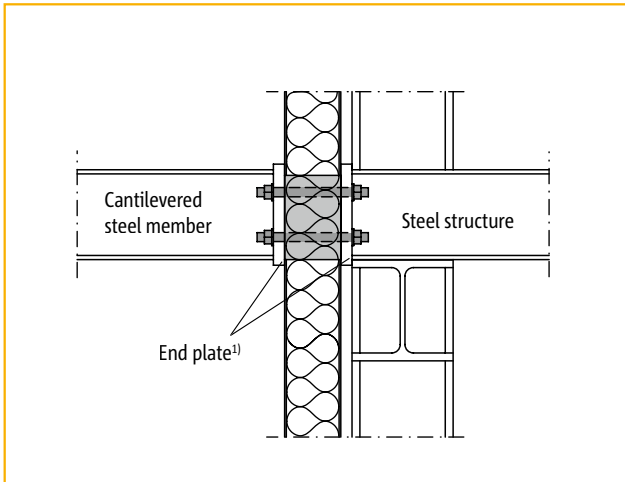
Schöck Isokorb® type KST for cantilevered steel structures
